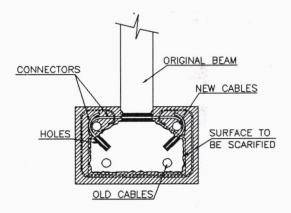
In early applications new cables were incorporated into concrete pour added to original section.
